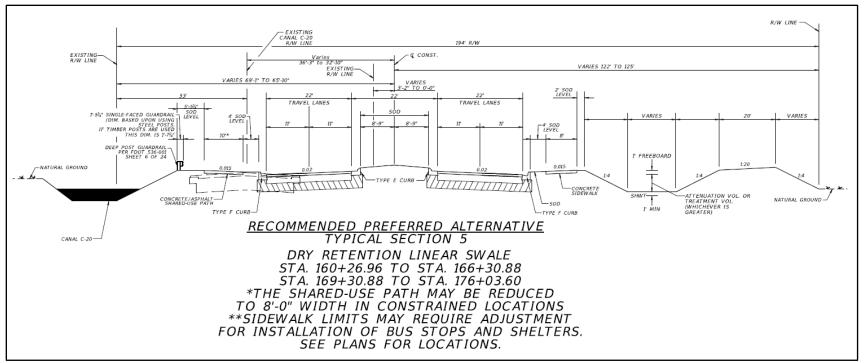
Representative Preferred Alternative Typical Section - Canal C-10 to West of Jupiter Boulevard
